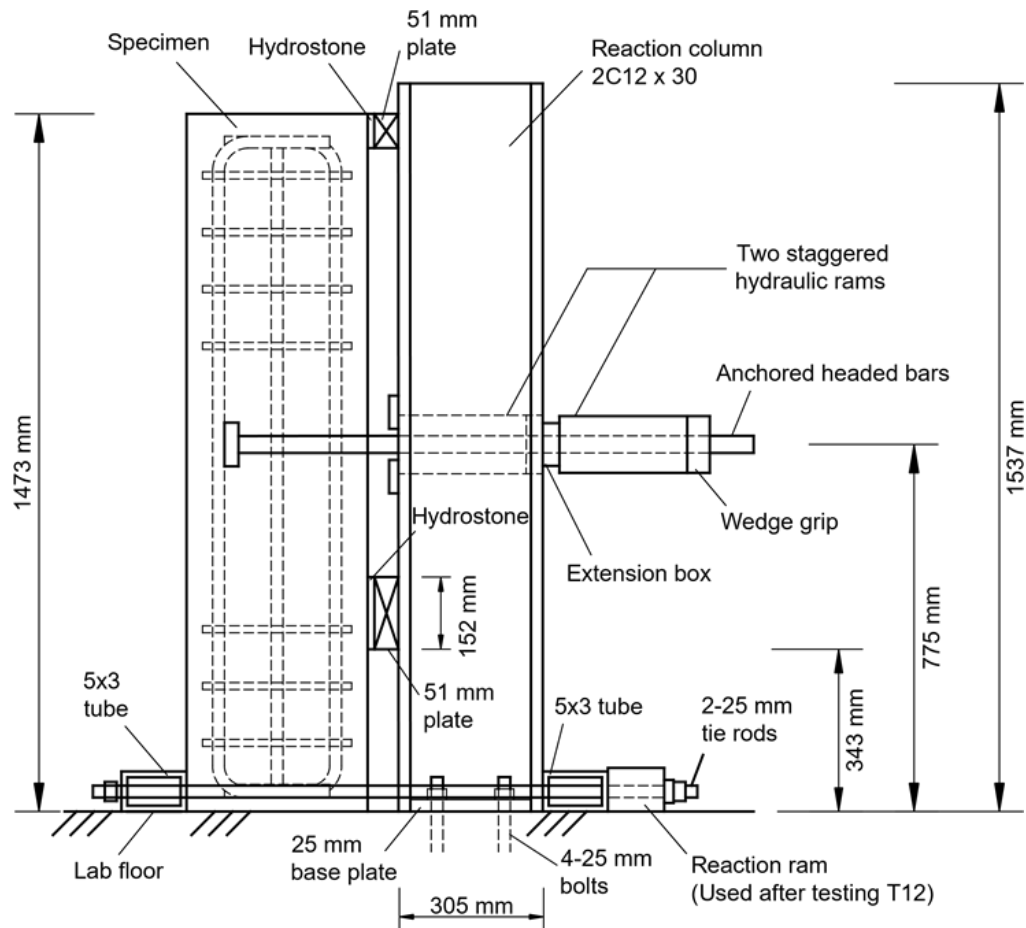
Test configuration for an exterior beam-column joint specimen [figure after Bashandy (1996)]
